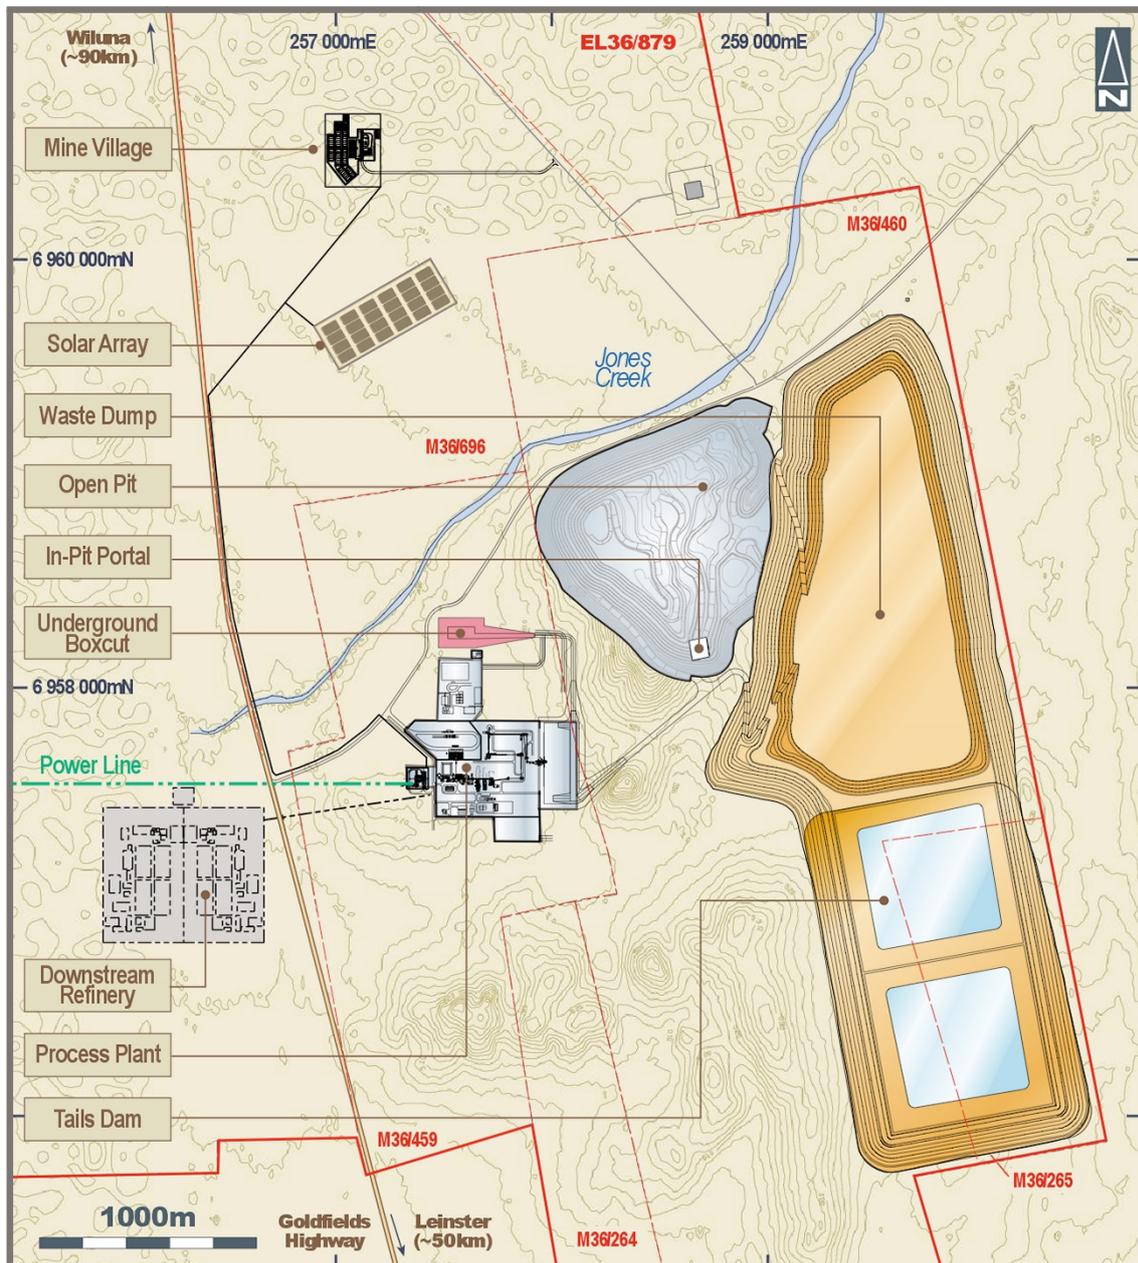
Kathleen Valley Project – Proposed mine site and refinery layout.
